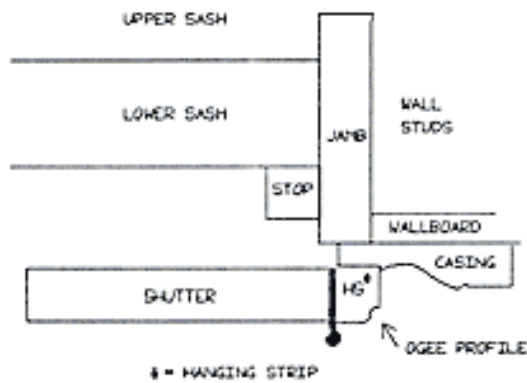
OUTSIDE MOUNT ON FACE OF CASING USING HANGING STRIP
